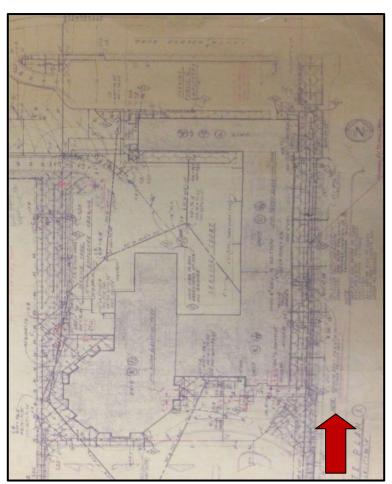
Site plan of Pleasant Hill Library, 1960. (Source: Pleasant Hill Library archives)
